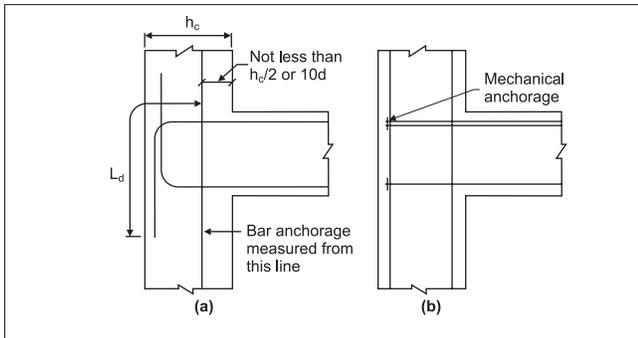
Anchorage of beam bars at an external joint<sup>17</sup>
